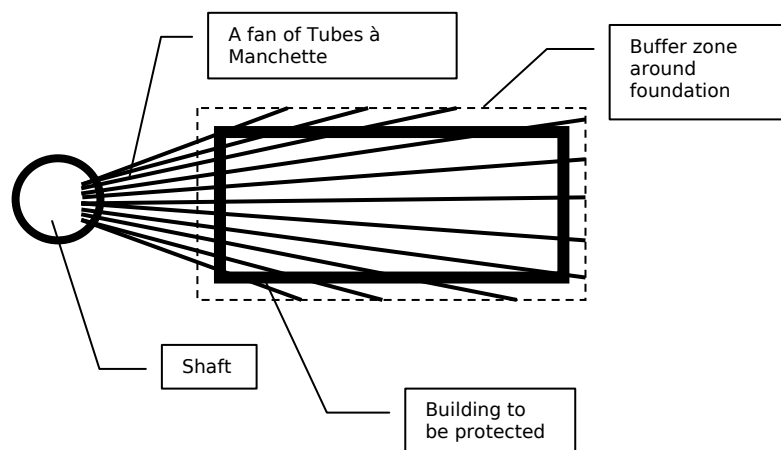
Schematic top view of the fracture grouting technique
